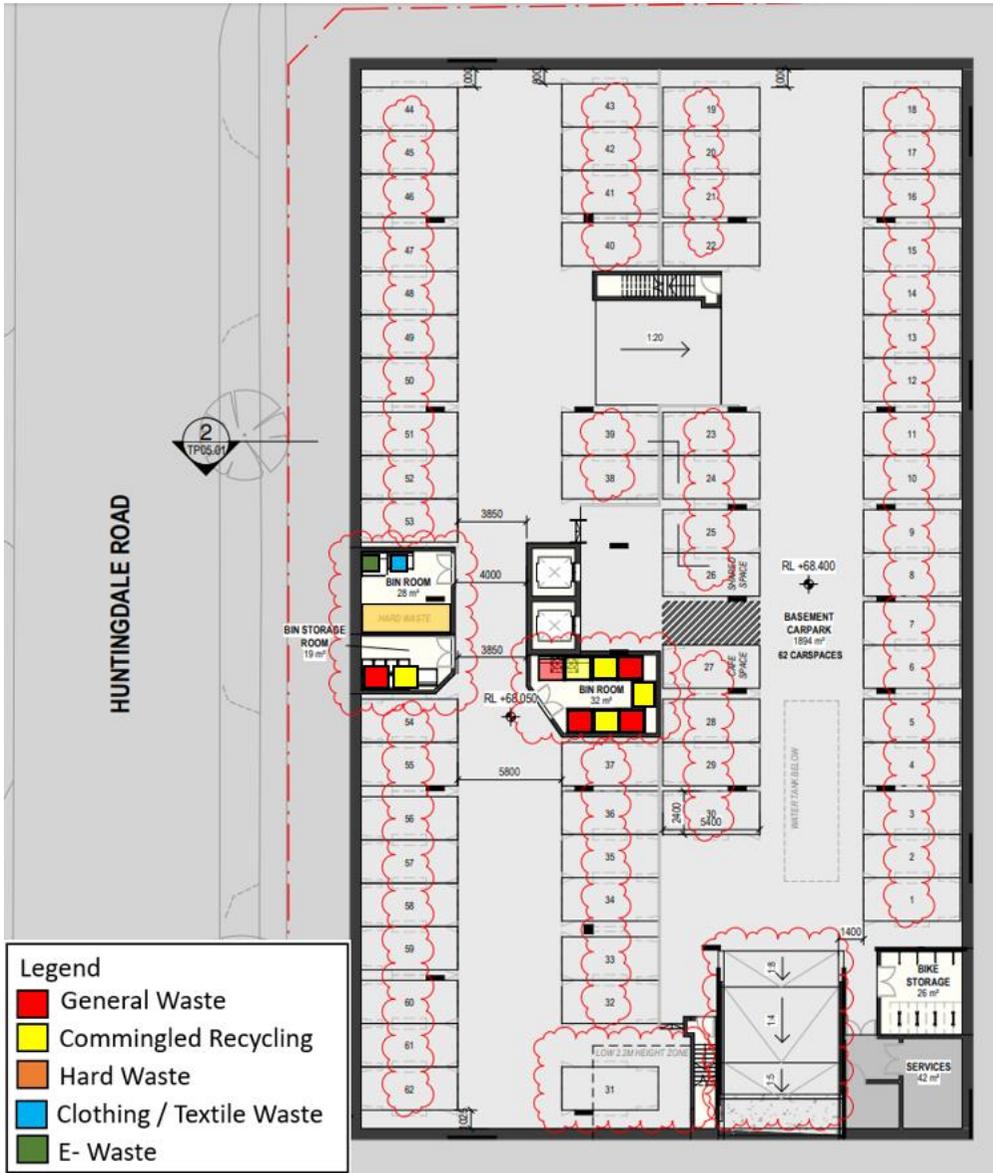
DEVELOPMENT PLAN – 4-STORY RESIDENTIAL BUILDING (CURRENT)
